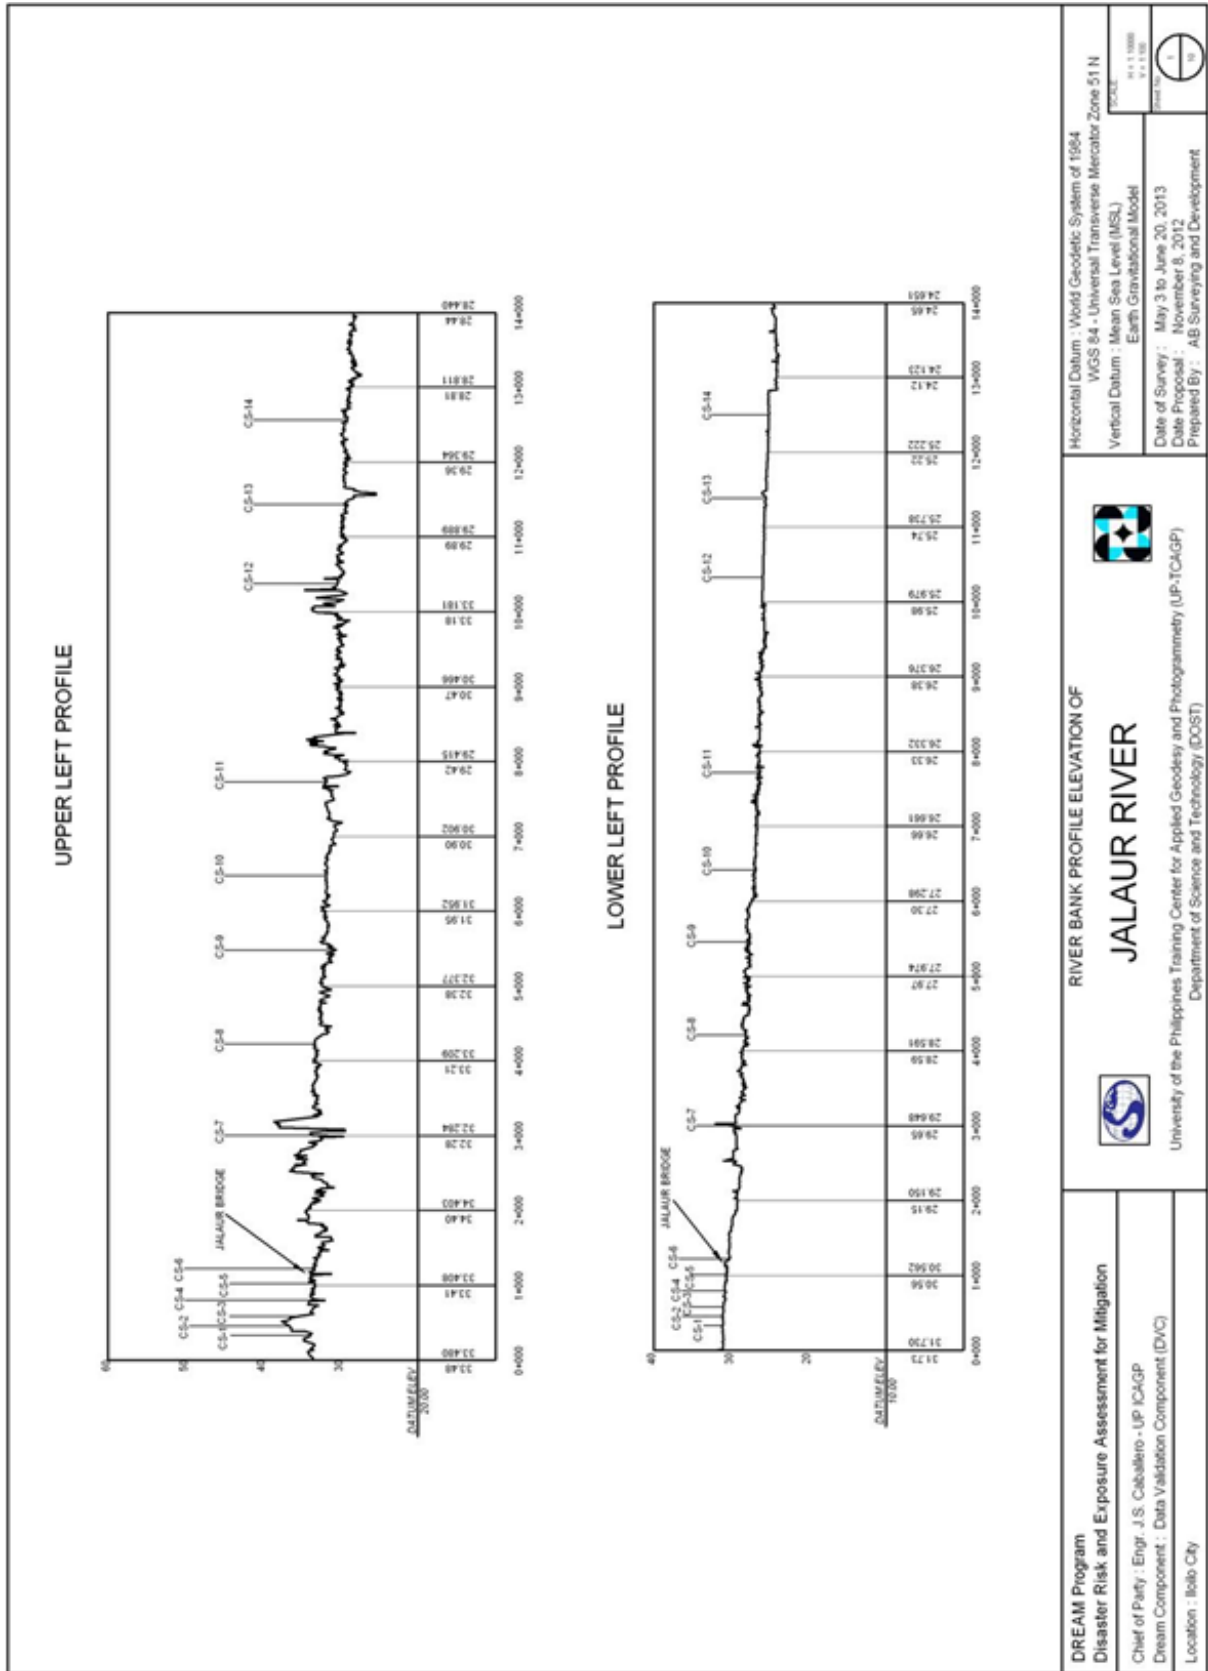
Sheet No. 1 Left River bank profile with relative location of bridge and cross-section
